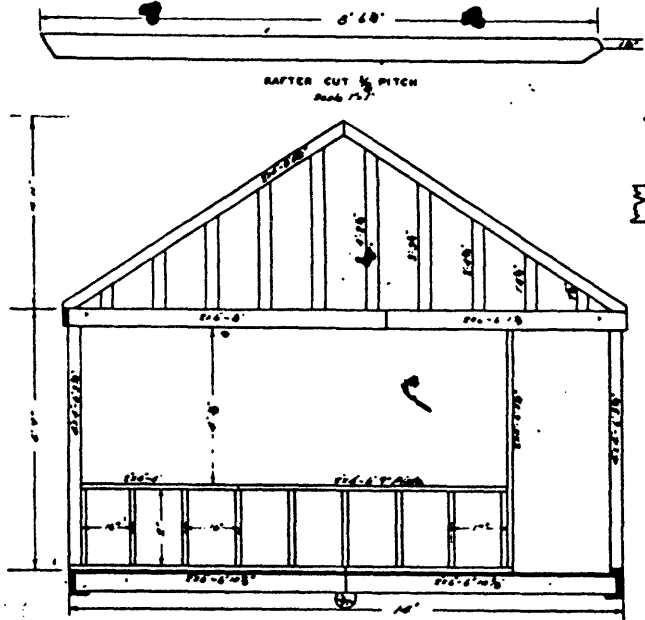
(5 sheets). Lookout house, Plan L-4, 1930 (1931
